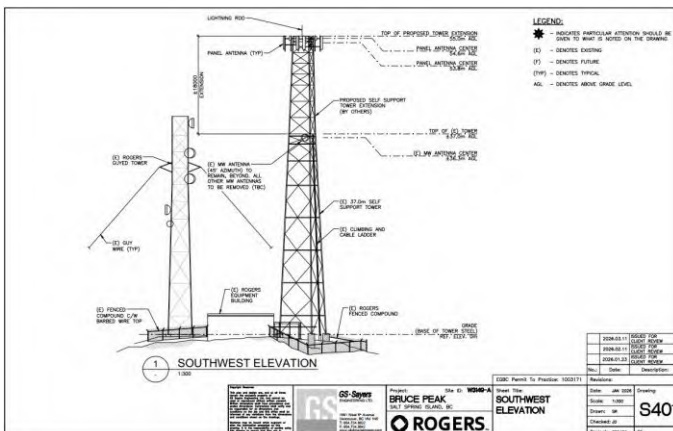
Elevation Plans for Proposed Telecommunications Facility
